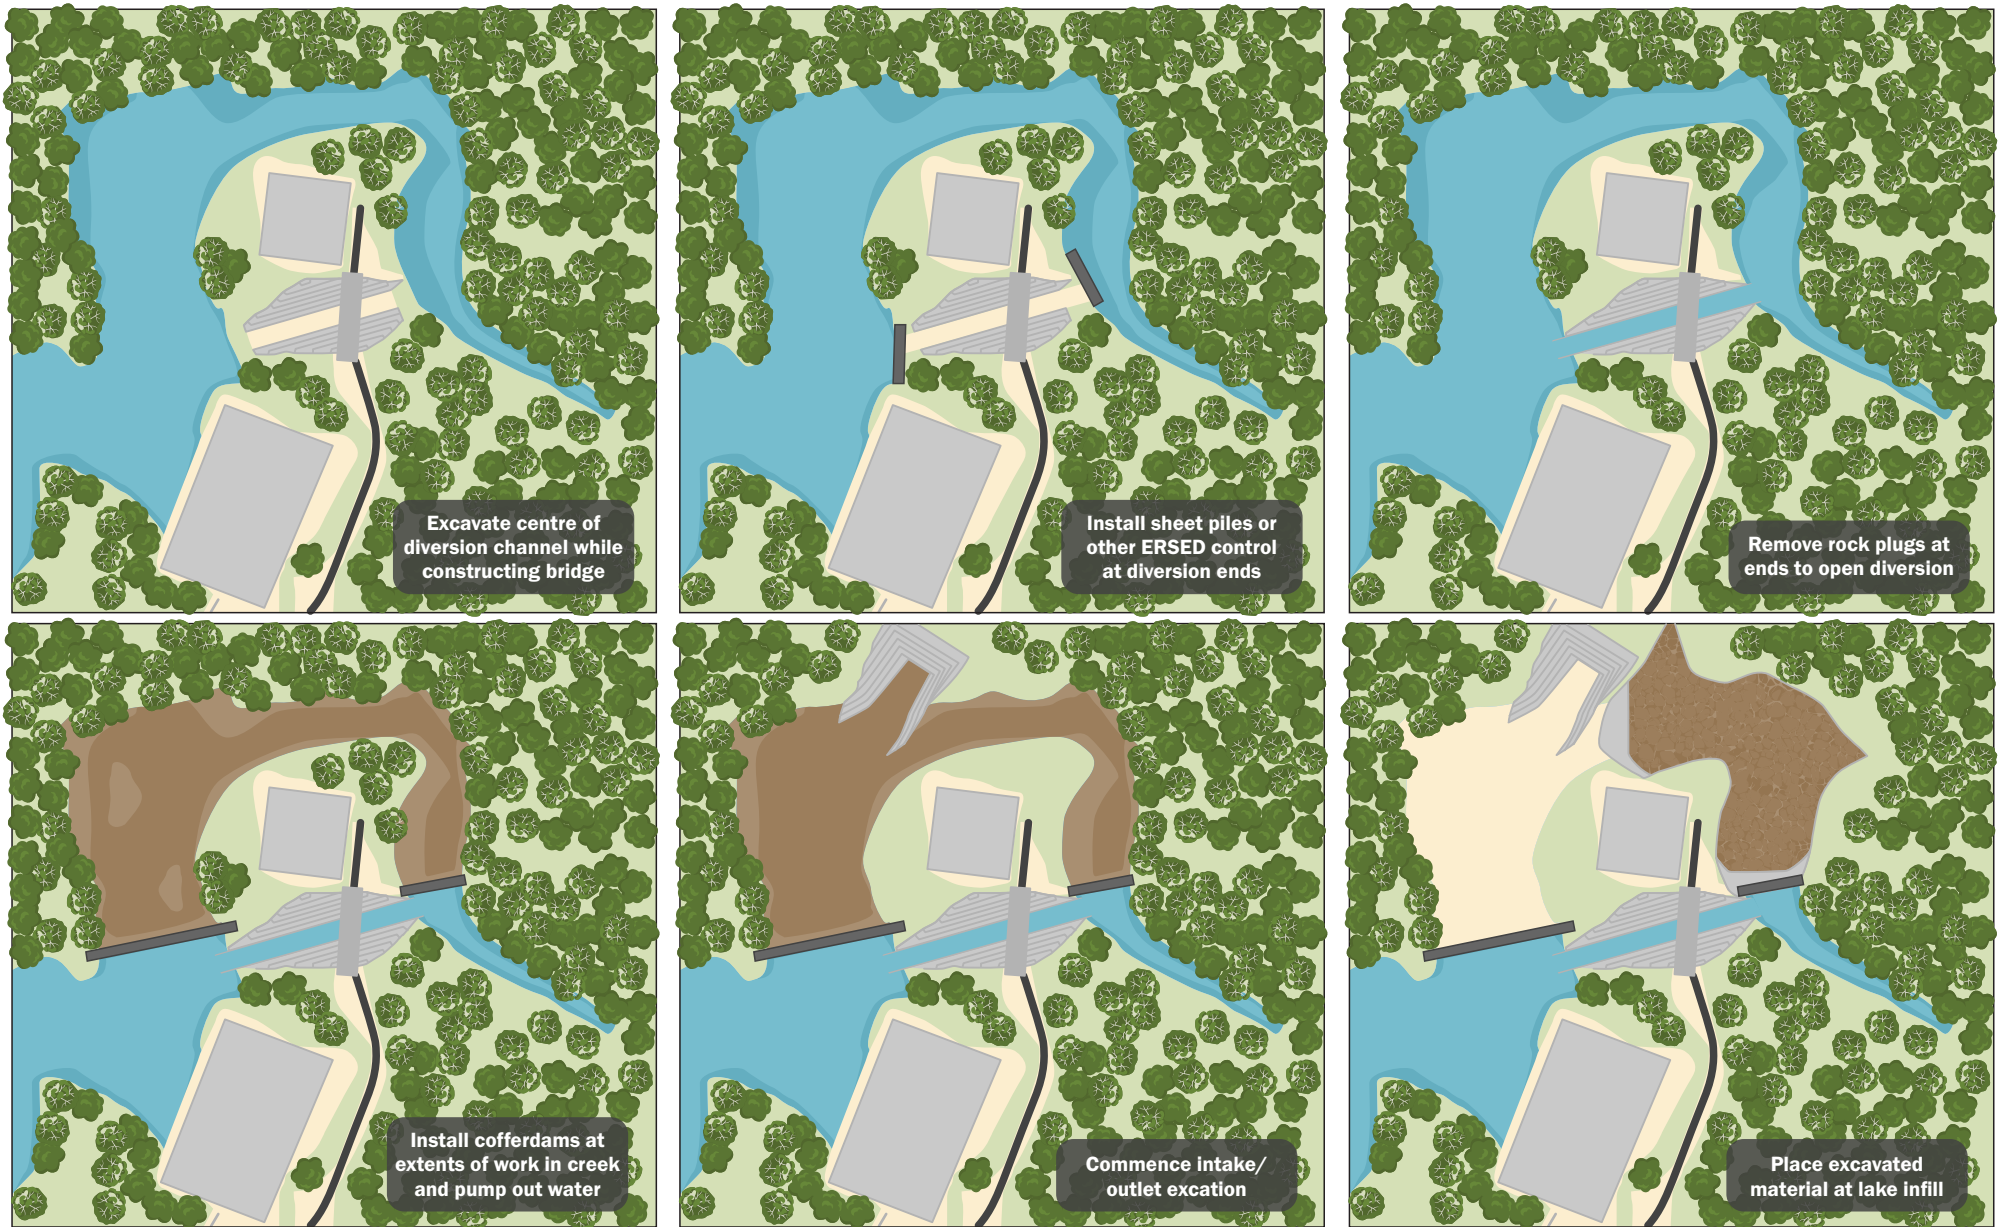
Planned sequencing of Lake Lyell diversion, Farmers Creek infill and inlet / outlet structure
